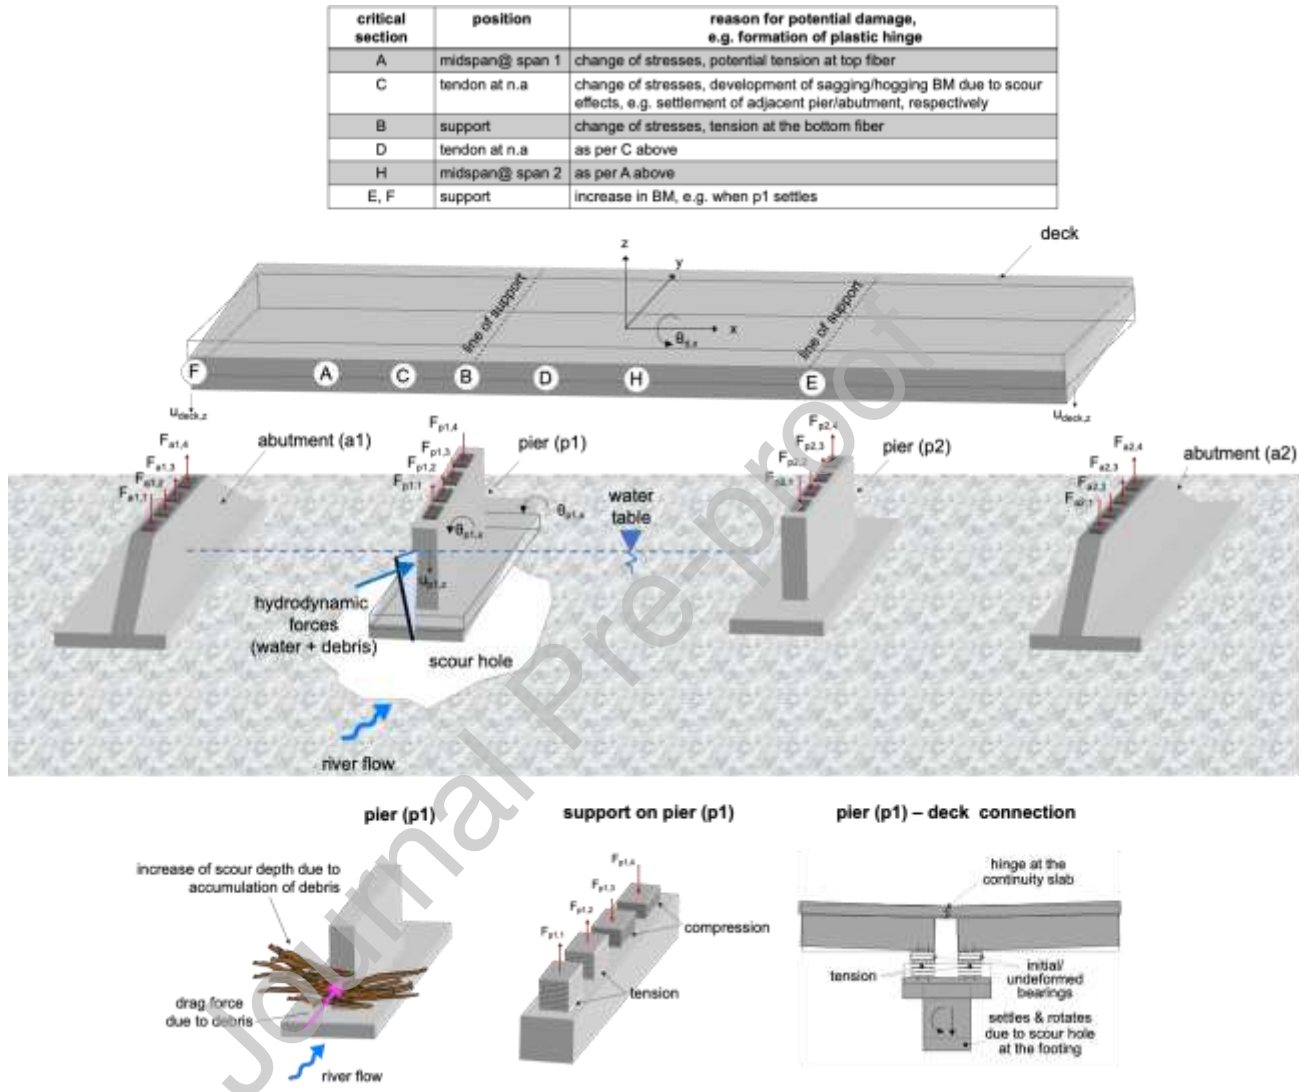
Interactions between bridge components, i.e. deck, bearing, piers, abutments, foundations, for pier movement due to upstream scour (indicative) and drag forces. The critical sections along the deck are also shown for a bridge with bearings.
